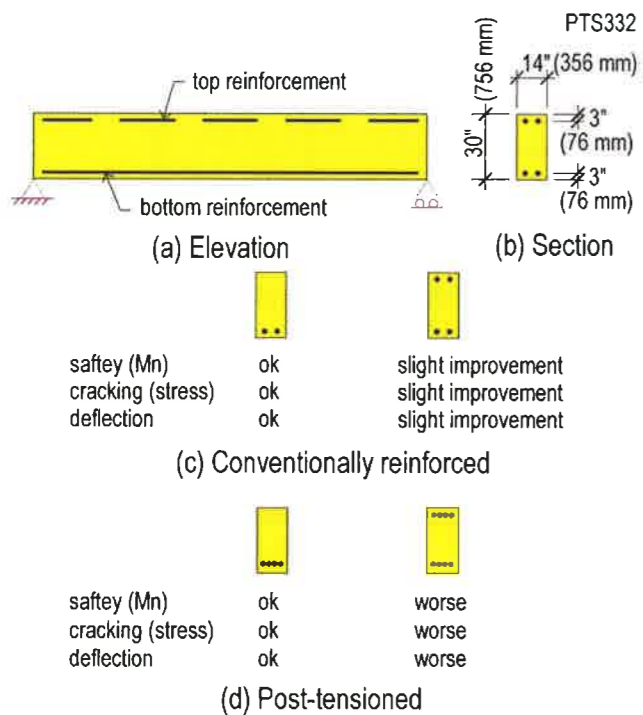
Performance of Member with Additional (i) Rebar, or (ii) Prestressing at Unfavorable Location
